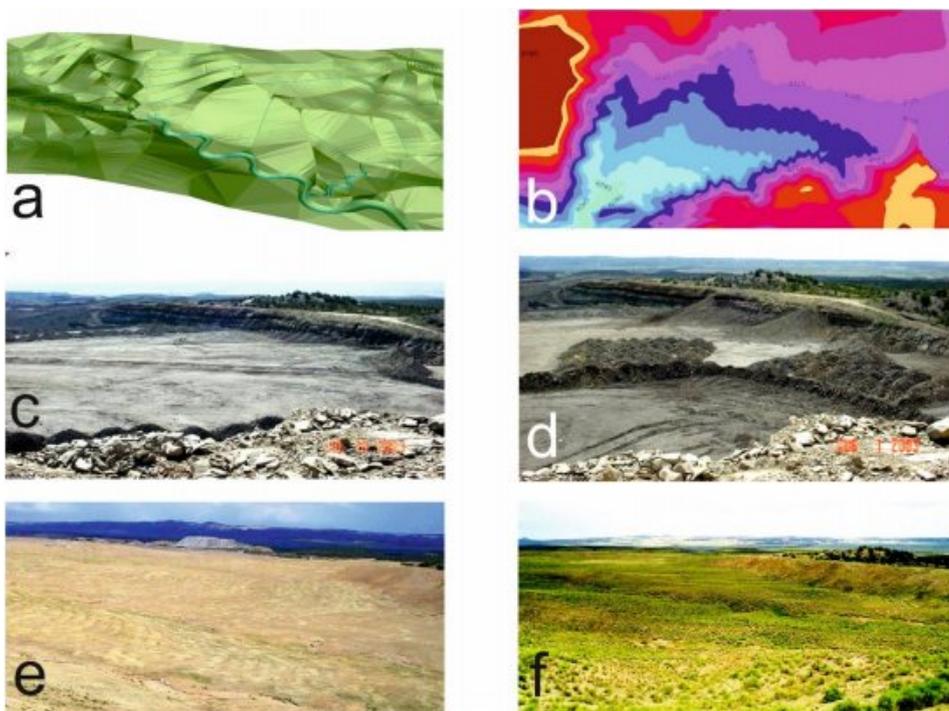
a) shows a 3D perspective view of an example GeoFluv design, b) is a plan view draft of a highwall reclamation project colored by elevation intervals, c) the early stage of reclamation earthwork to reclaim a highwall, d) the waste earth material is beginning to be placed according to the fluvial geomorphic design to make the reclamation landform, e) earth material has been graded to the fluvial geomorphic design and a suitable topdressing for reseeding applied, and f) shows the completed fluvial geomorphic highwall reclamation on the upper right to center (much of the remaining 15.4 ha subwatershed area is shown on the left).
